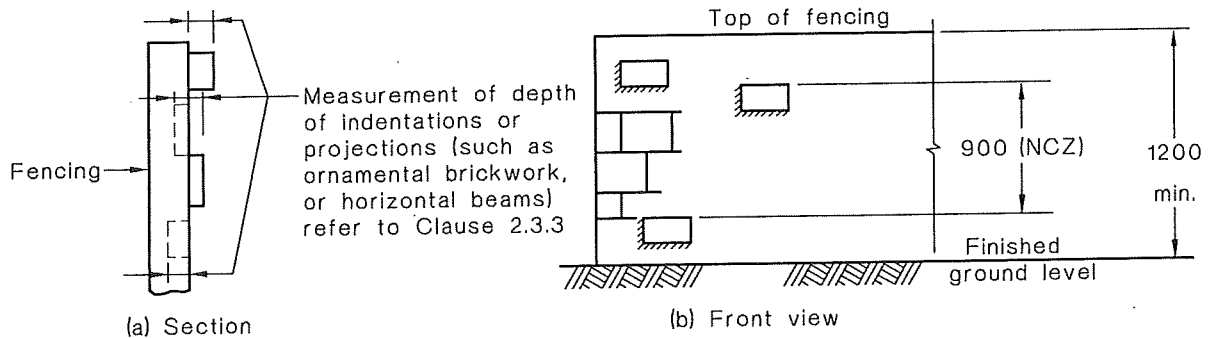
(in part) PERPENDICULAR FENCING DIMENSIONS
